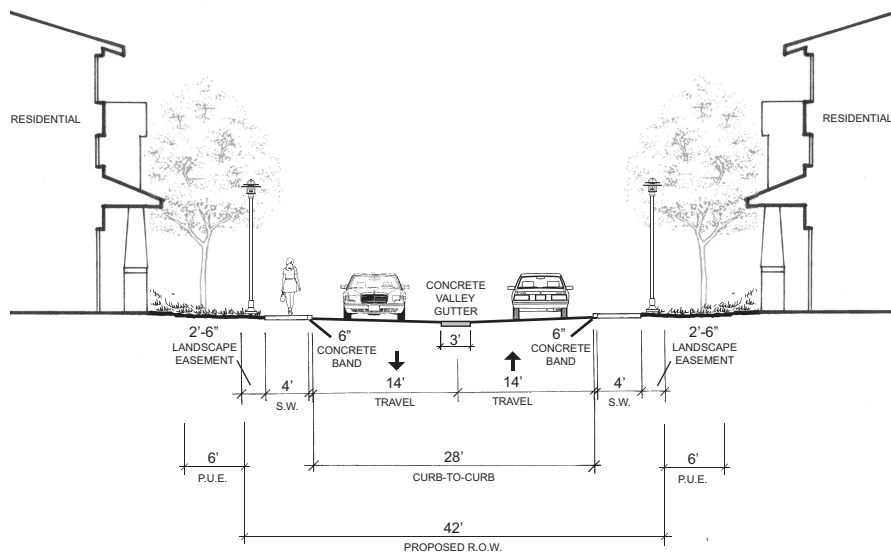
D.40: Cross Section of Typical Private Entryway at T-Court ③
